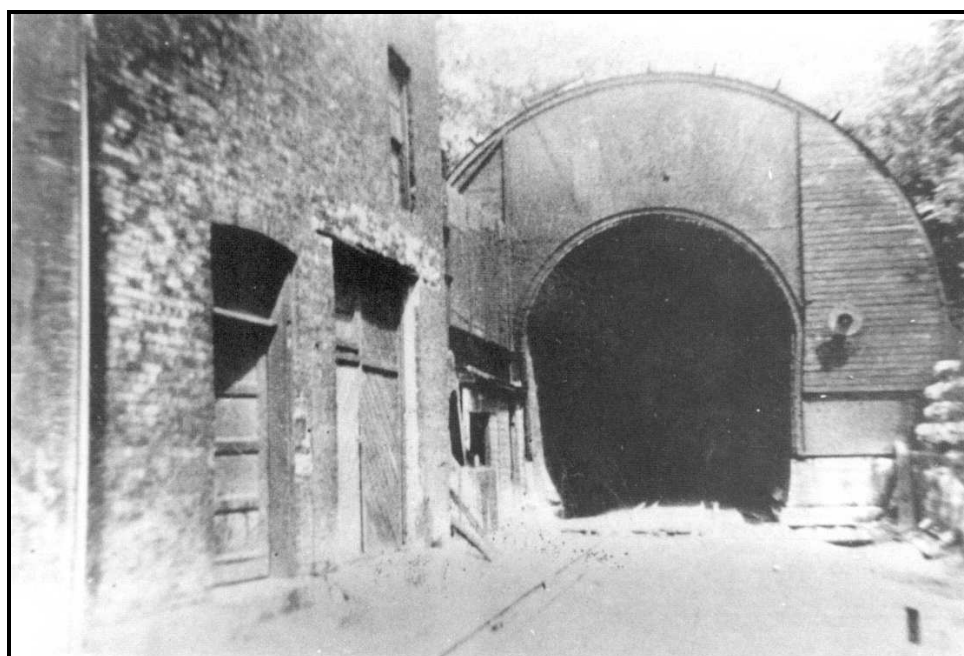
Closer view of the brick fan house. By this date, an addition had been added onto the south end of the fan house. Also, two original window openings had been converted into a wide freight door (compare to previous figure). Note the steel-frame nozzle around the tunnel portal (Huddleston 1998:53).
